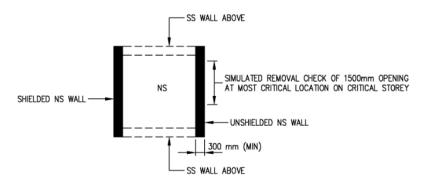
B(ii): UNSHIELDED NS WALL OF SS TOWER
